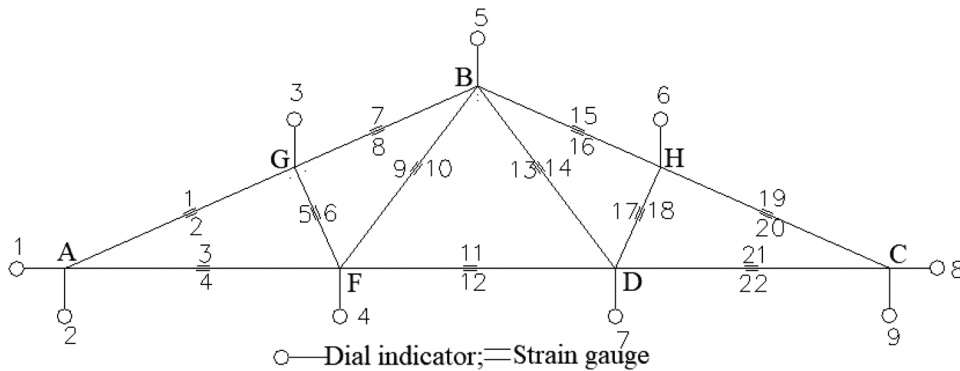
Arrangement of measuring locations for the truss specimens DC-HJ3 and DC-HJ4
